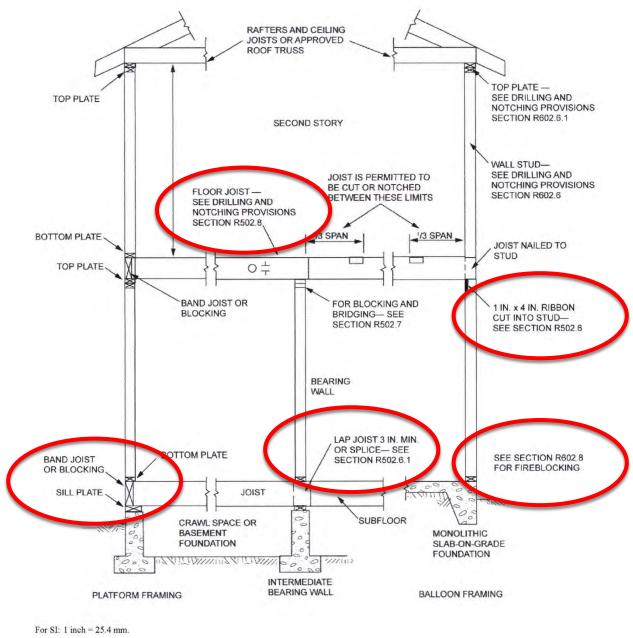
(1) TYPICAL WALL, FLOOR AND ROOF FRAMING
